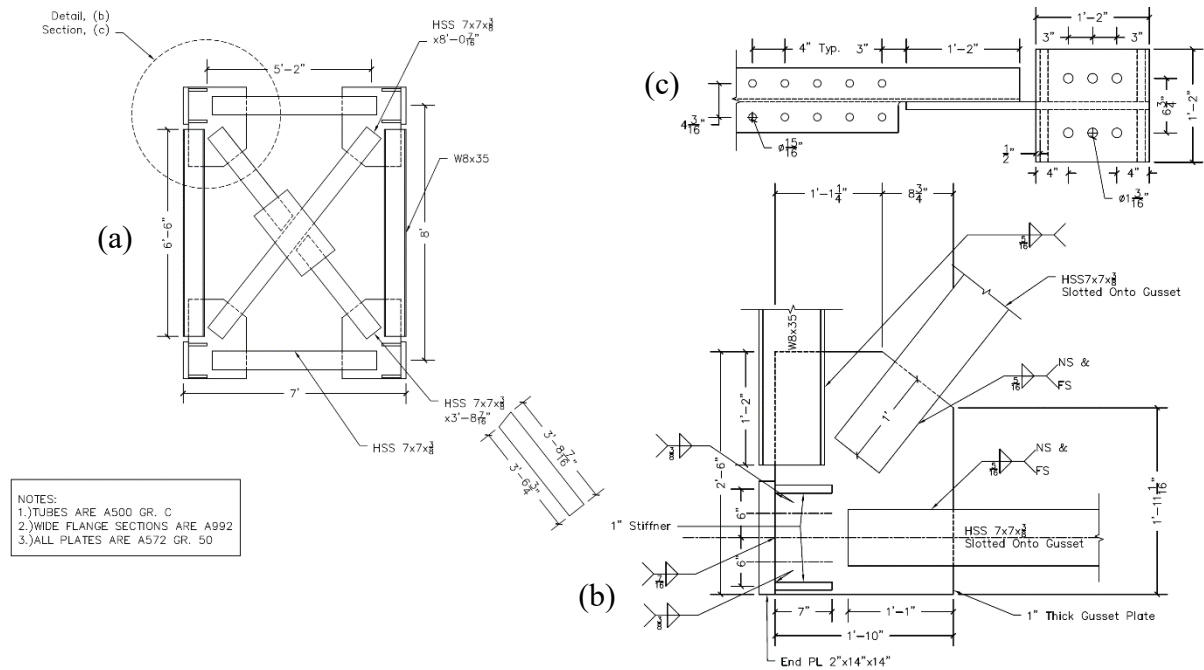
Details of Reactions Truss: (a) Plan View of Truss; (b) Corner Connection Plan Detail; (c) Corner Connection Section Detail.
